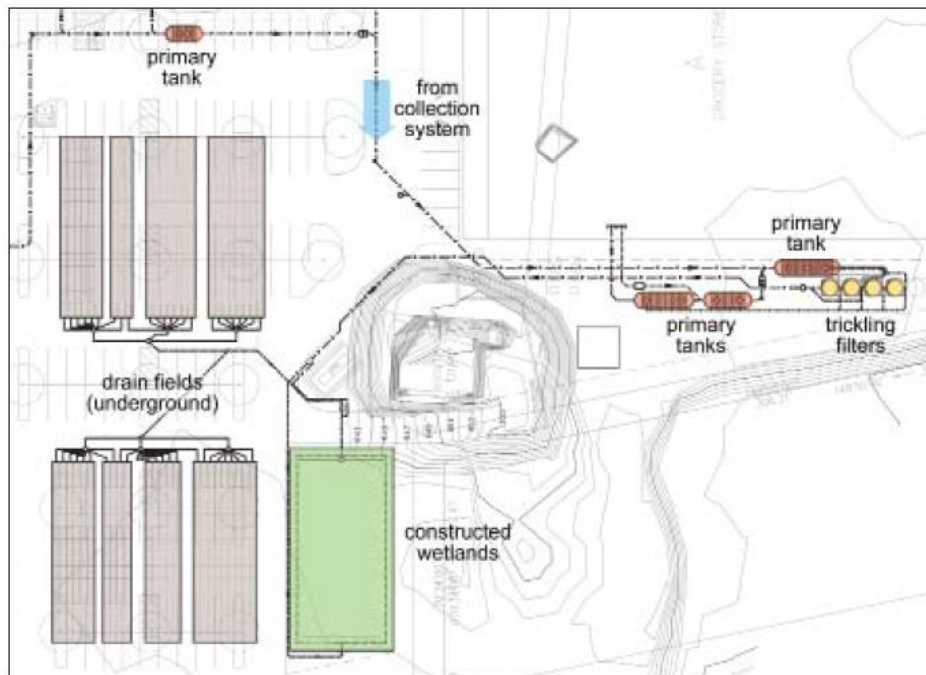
Site Plan of Puna Kai Shopping Center WWTP
